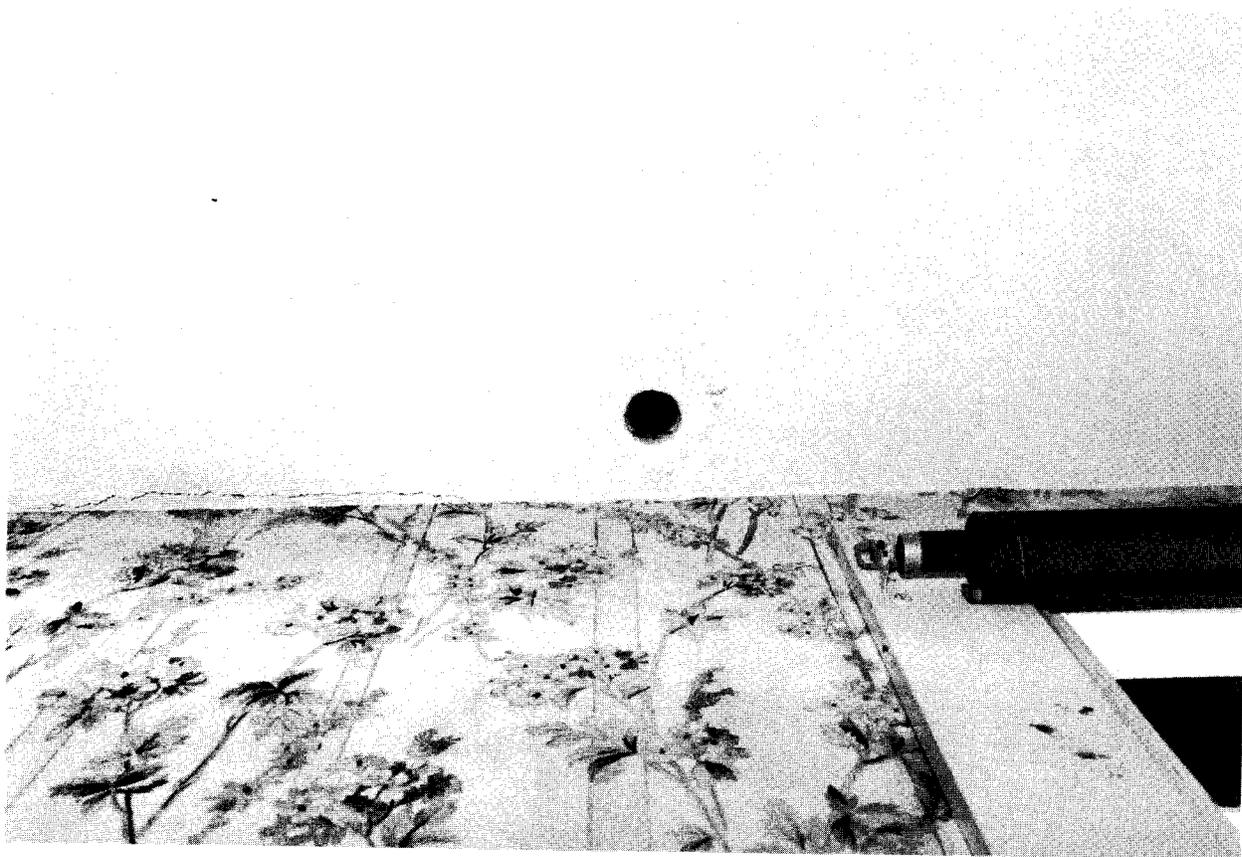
Penniman House: Northeast Bedroom (Room 206),
